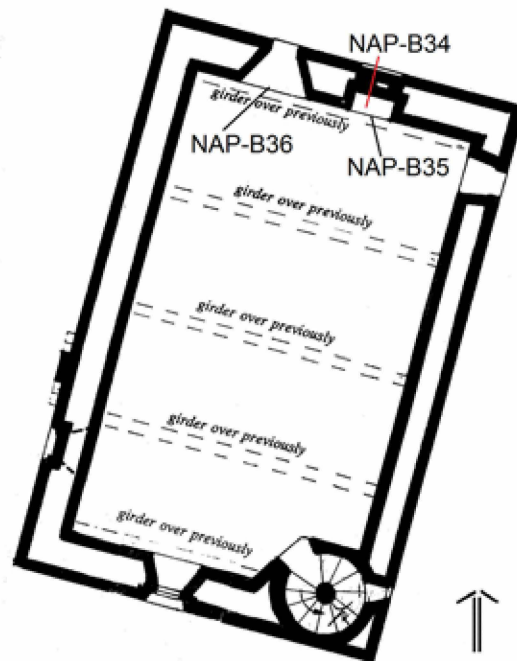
High-end tower, second-floor plan showing the location of samples NAP-B34–6 (John Warren)
